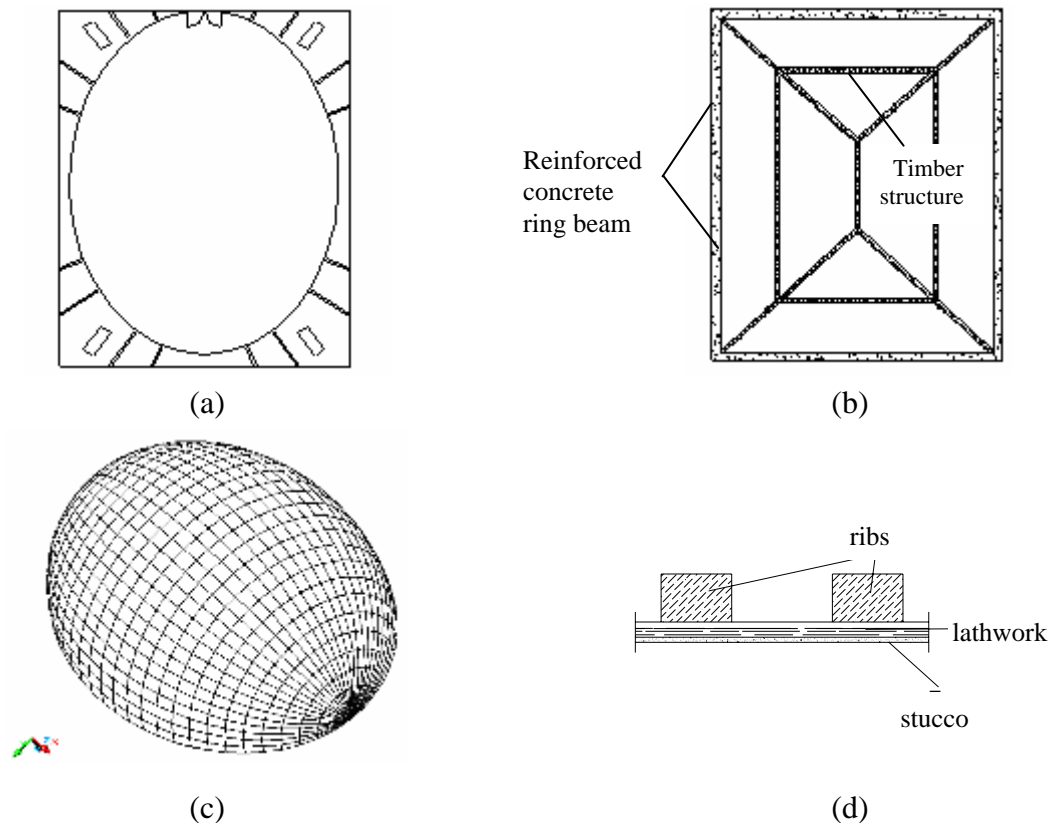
Reliquary Room: (a) plan with main vault and secondary vaults; (b) main roof structure; (c) view of lathwork vault; (d) detail of vault structure
